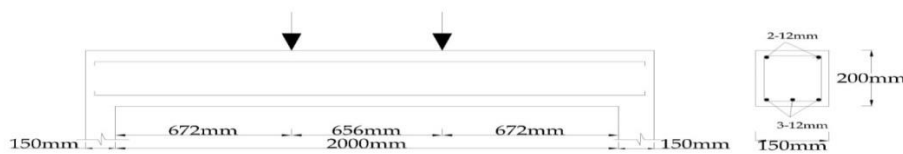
Beam Setup for a/d 3.8 with reinforcement details
